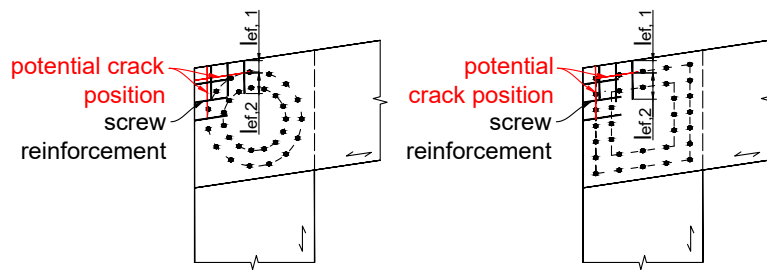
Corner reinforcement (gravity load case) for a lapped knee joint.
